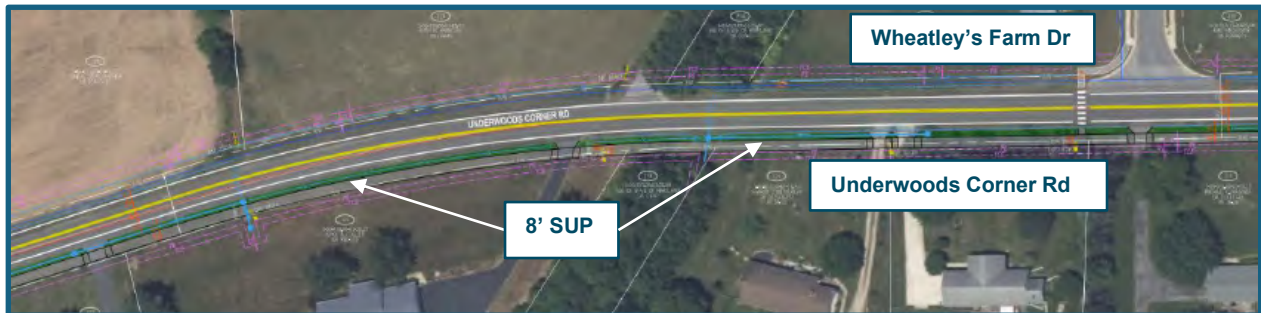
Underwoods Corner Road - Shifted North Toward the Field & Ties into Existing Centerline
